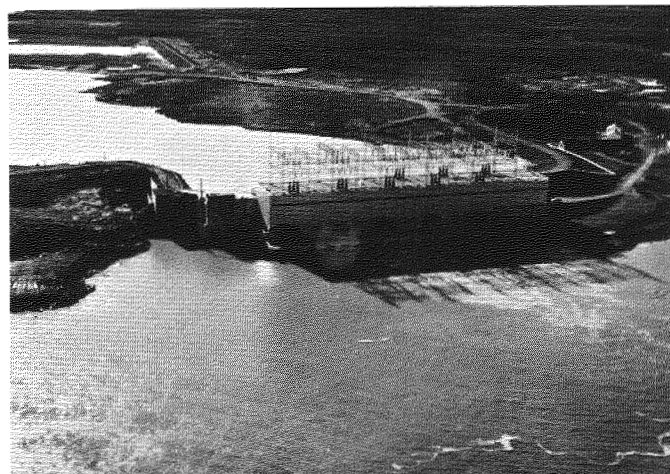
Aerial view showing powerhouse and No. 1 and No. 2 west, Oct. 1960
